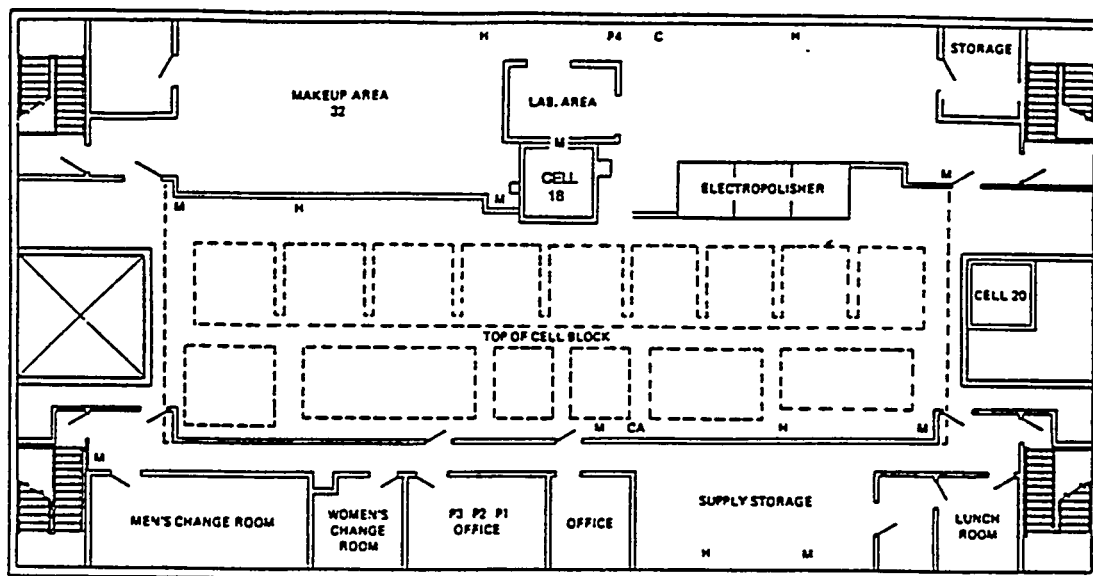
Floor plan of Building 3517—Fission Product Development Laboratory.
